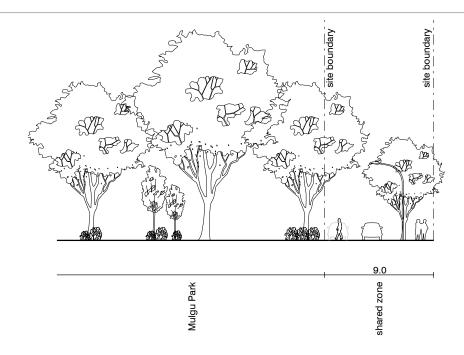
Epsom Park – Fuse Street Short term Section I
